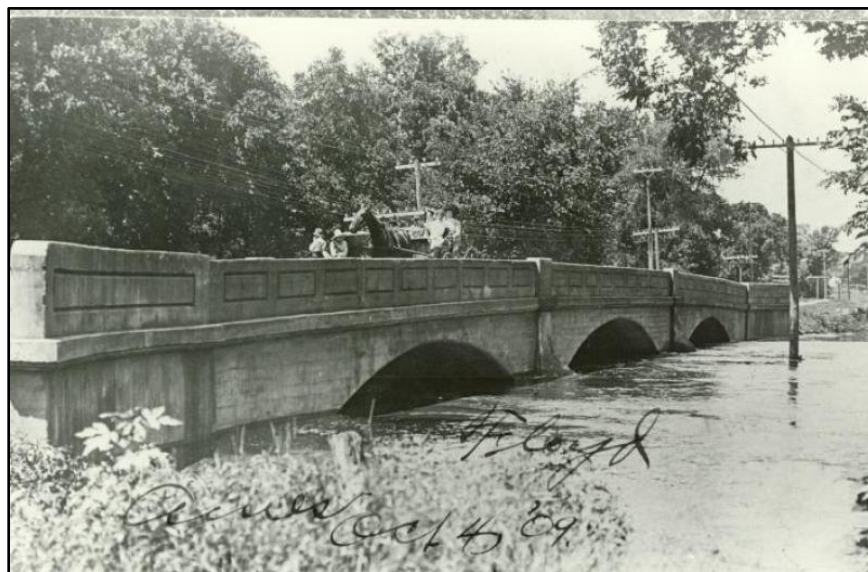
Lincoln Highway bridge over Loway Creek. Within the year of construction, this flood water threatened the stability of the bridge, 1909.
